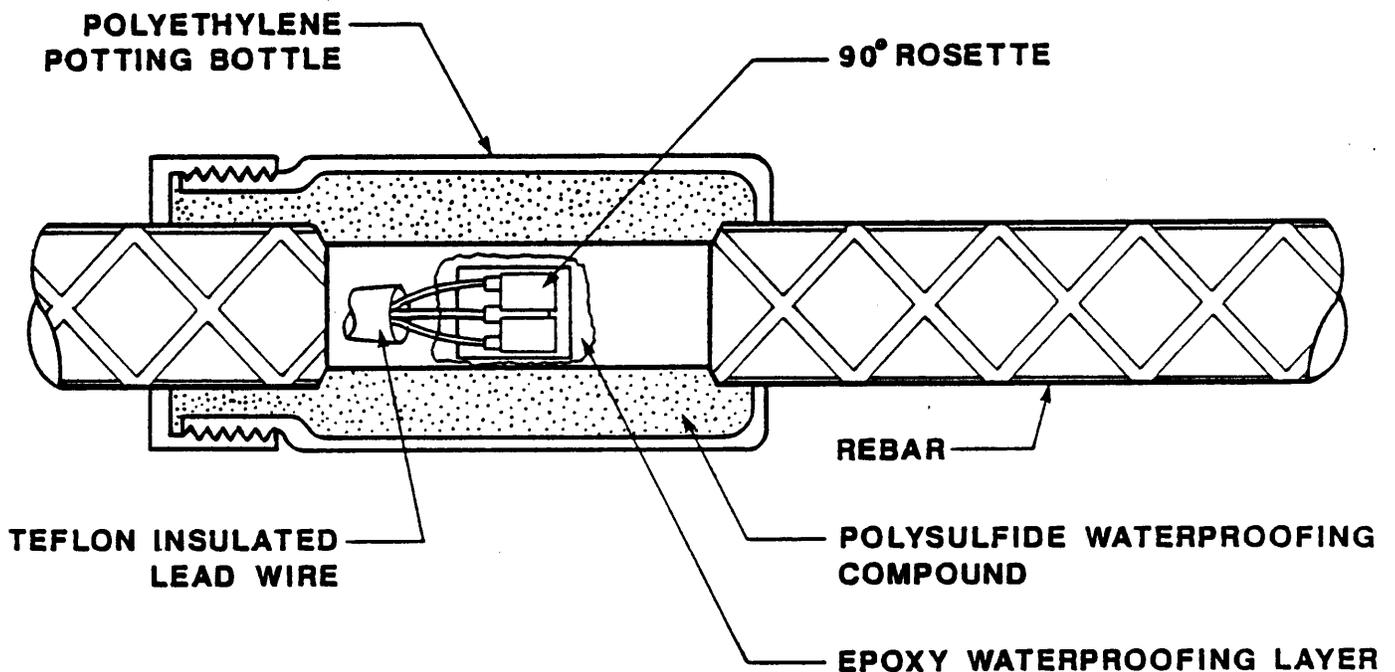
Instrumented dummy reinforcing bar for field use.
